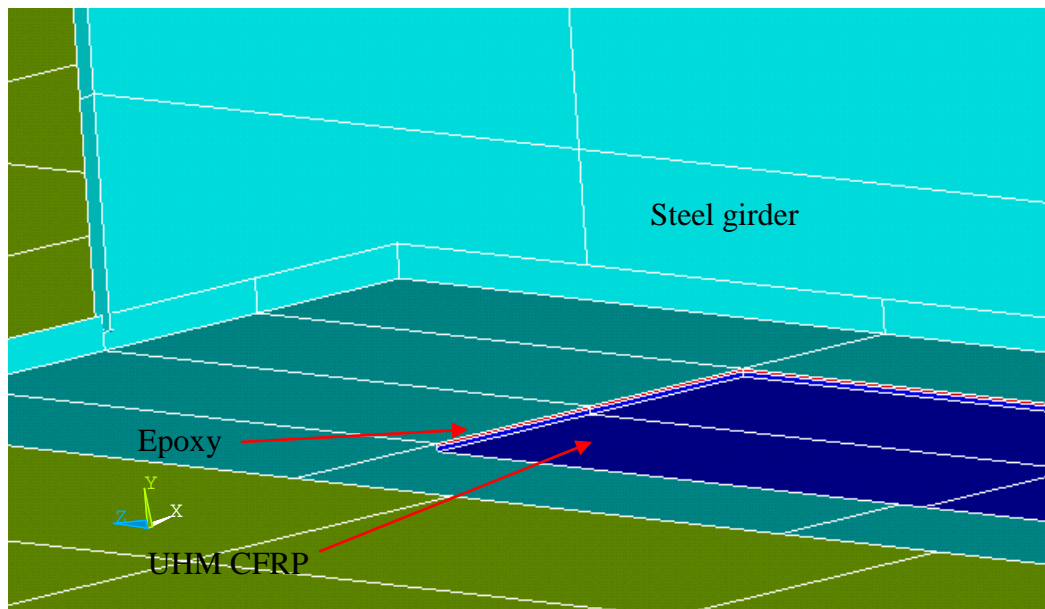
Steel girder model with epoxy and CFRP layer
